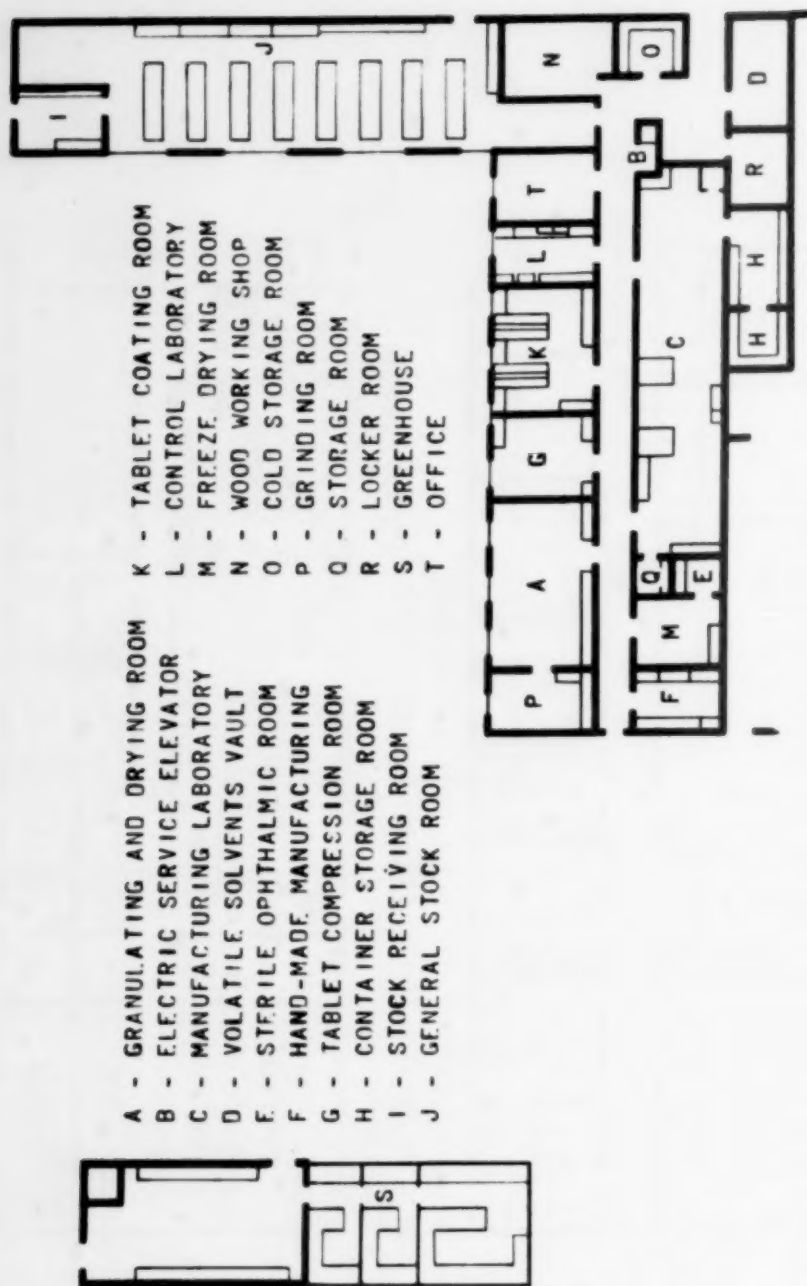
GROUND FLOOR PLAN, SCHOOL OF PHARMACY, WEST VIRGINIA UNIVERSITY (GREENHOUSE IS LOCATED ON THE ROOF OF THE NORTH WING)
